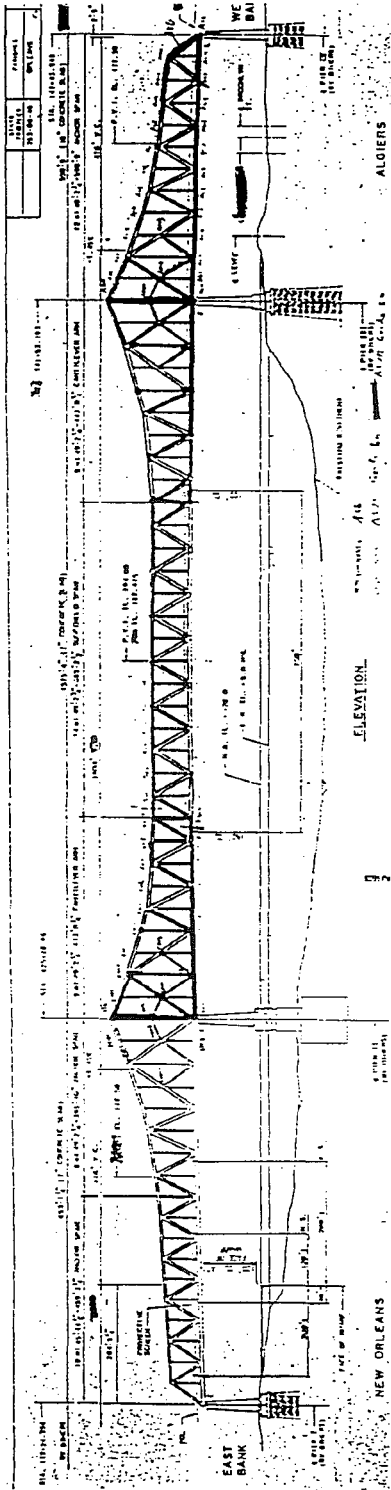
Elevation of the Greater New Orleans Bridge #2
